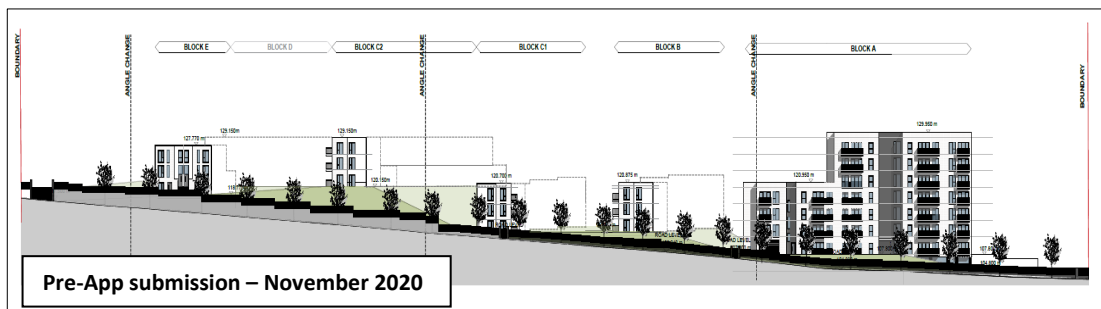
Site Section Pre-Application Proposal November 2020 (Source: RAU.)
